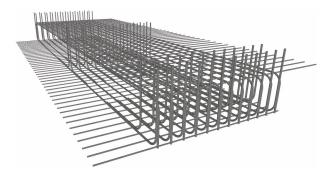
Prefabricated reinforcement cage for the floor (SketchUp).
